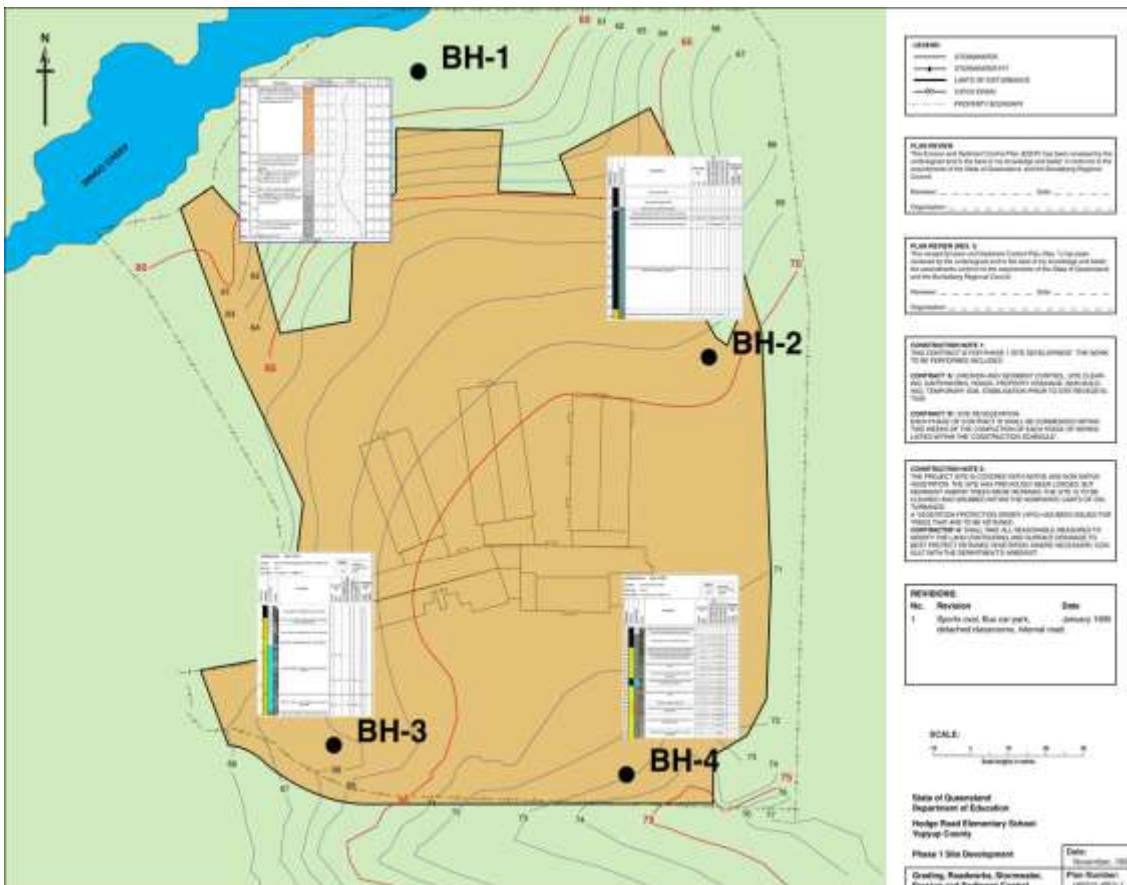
Soil test bore hole locations for the Hodge Road school site
